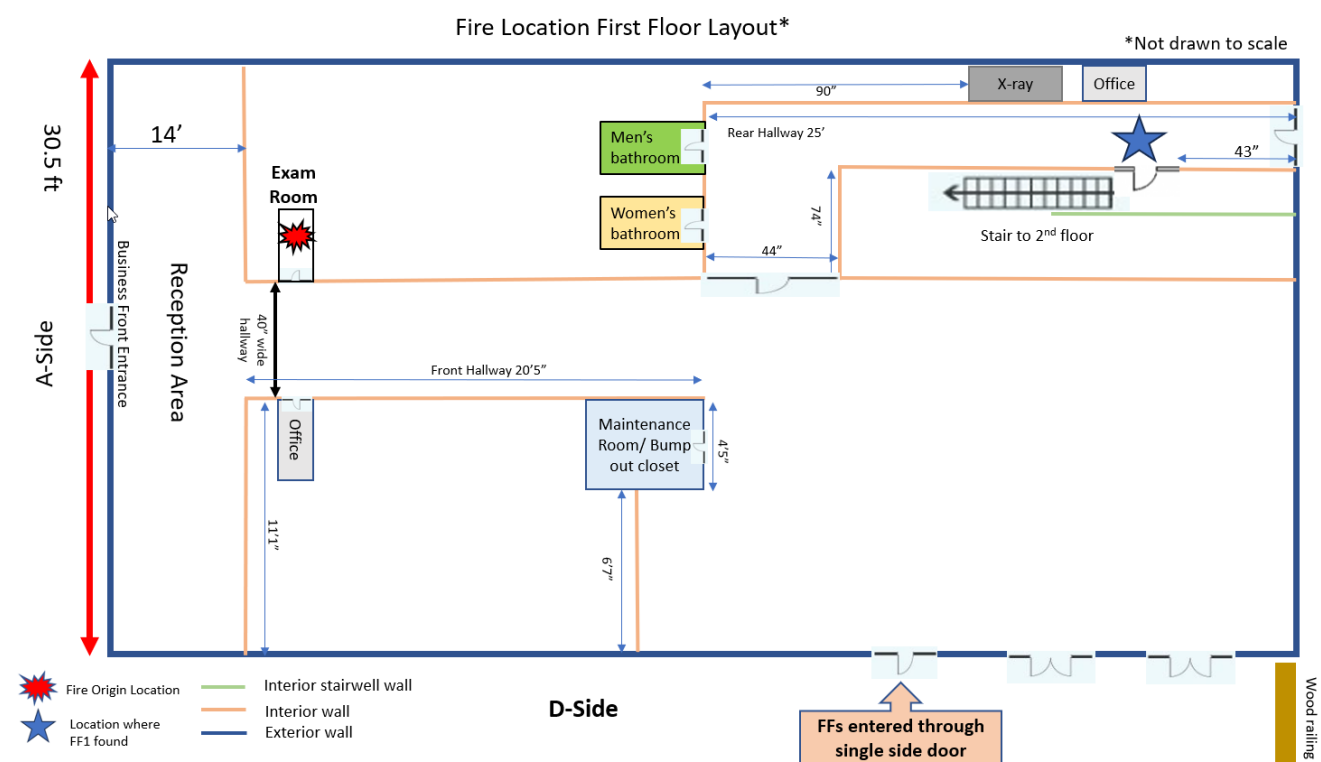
Layout of first floor of structure fire. The blue star indicates the location where FF1 was found.
